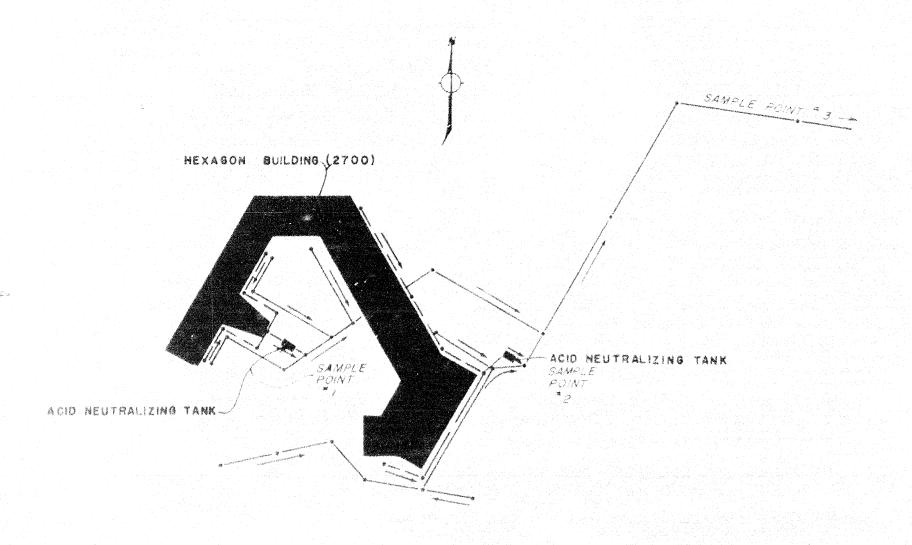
HEXAGON BUILDING - SEWER DETAIL.
